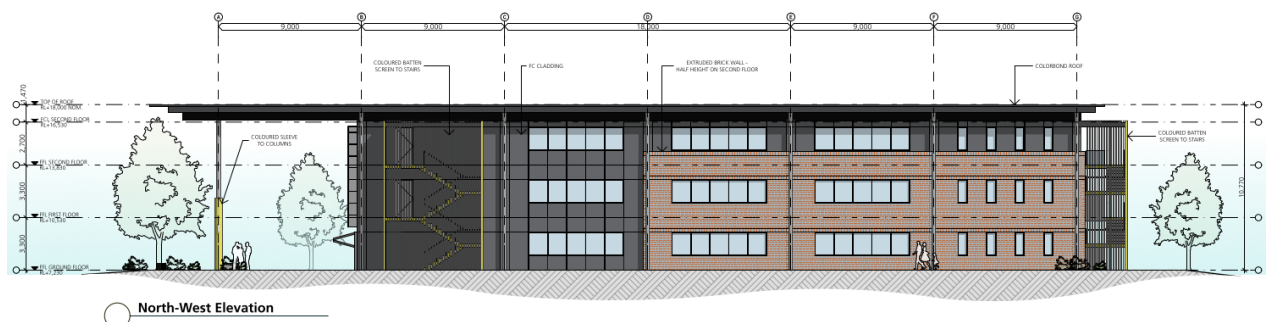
Northwest elevation of the proposed Education Establishment Building.
